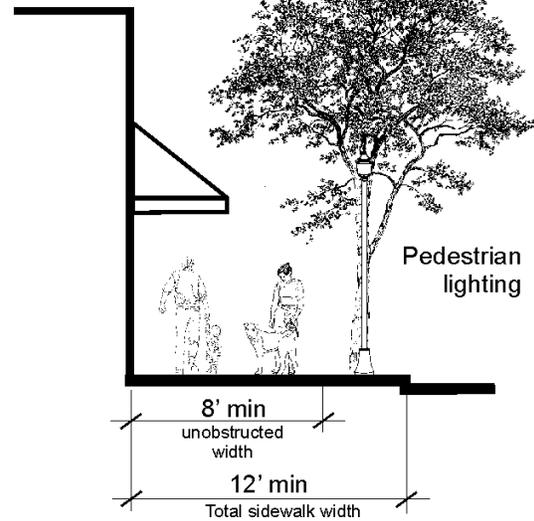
An example of an internal walkway designed to look like a traditional urban sidewalk.
